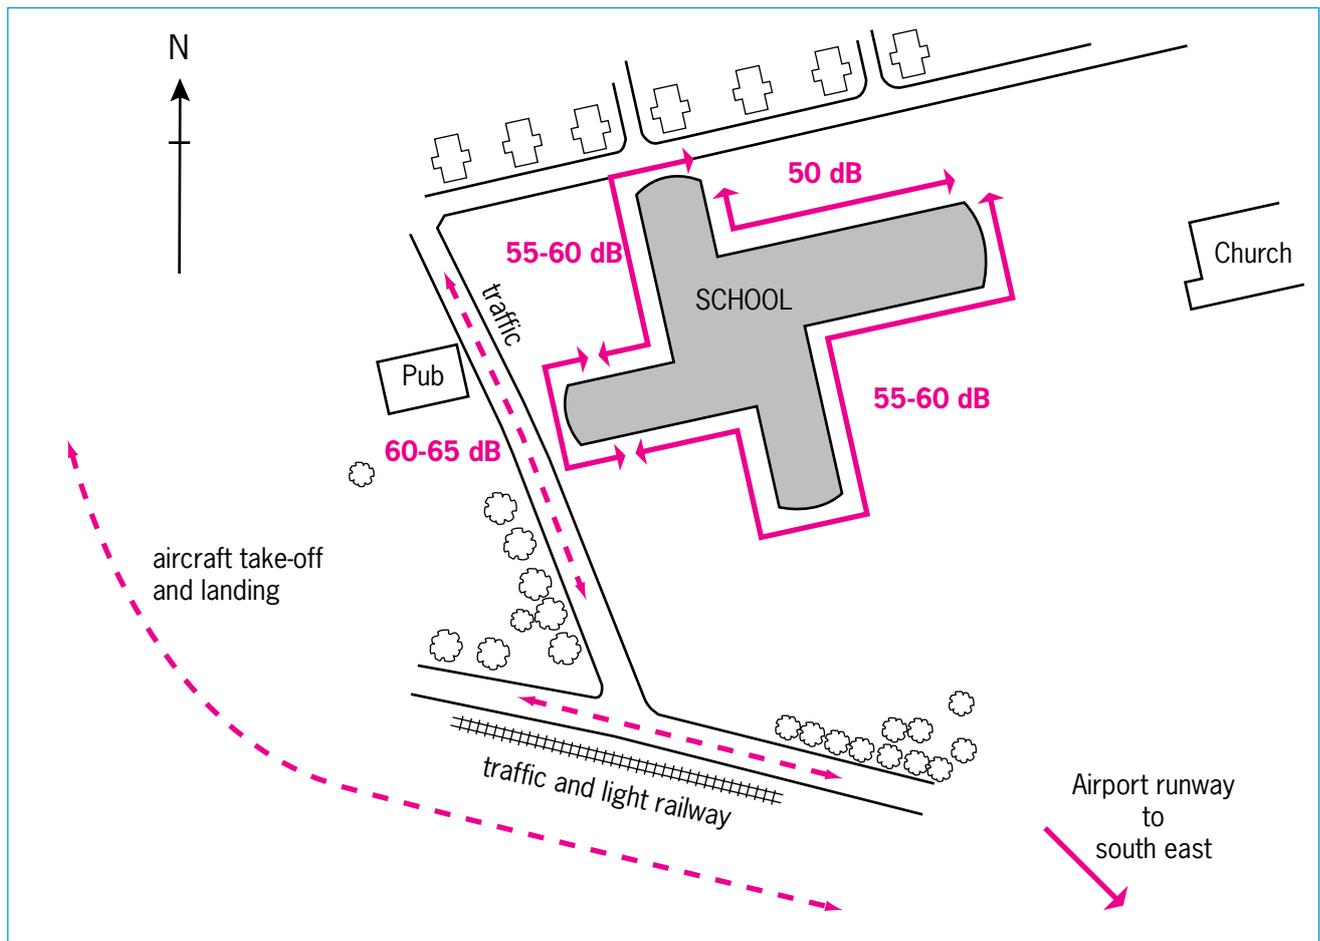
shows a site plan, based on the site survey carried out at the start of the project. The high external noise levels are generated by low-flying aircraft and traffic on nearby busy roads. One option would have been to acoustically seal the building envelope and mechanically ventilate the building. However, this was too expensive for the available budget. The design team also wished to reduce lifetime costs and opted for a naturally ventilated building which would maintain the same internal noise levels.
